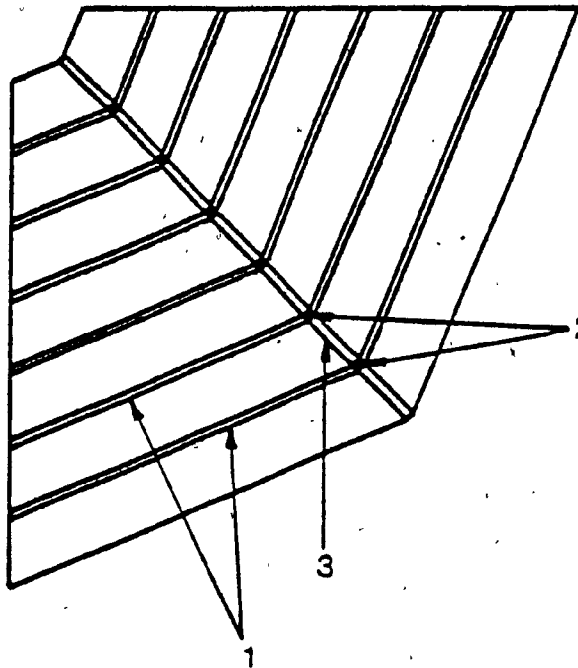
PARTIAL PLAN VIEW OF A TYPICAL RING TRUSS.
